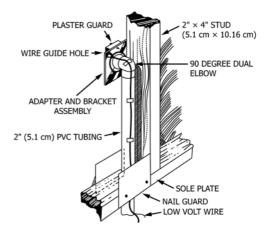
Stud-Mounting Bracket Assembly (New Construction)
